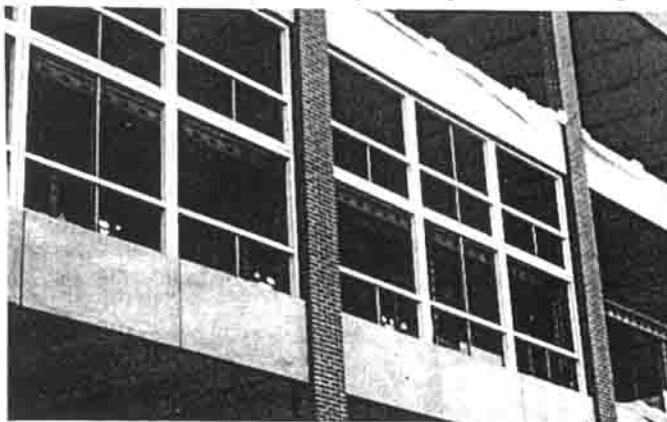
Building 42S, east wall, showing new facade required after removal of 1917 quadrangle section.
